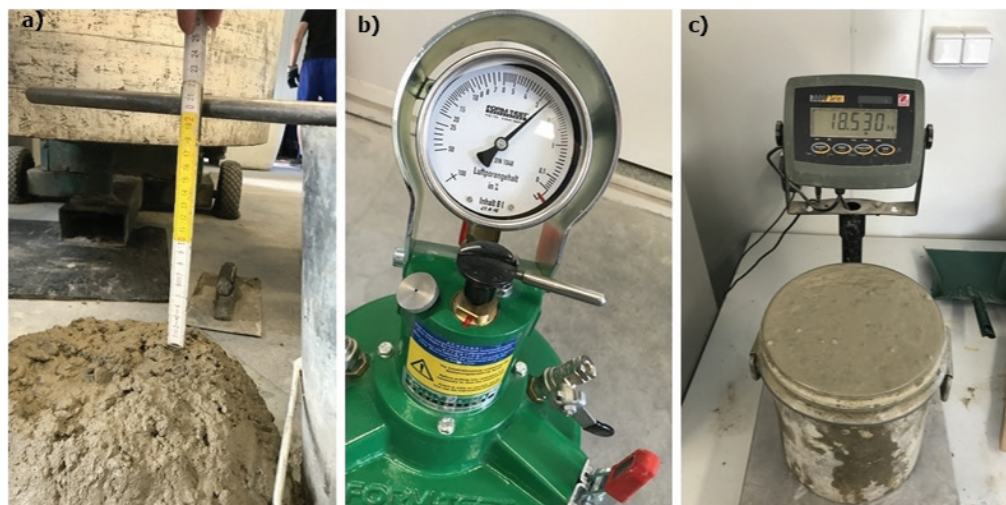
Testing of the concrete mixture: a) slump test of the concrete mixture; b) air content test of the concrete mixture; c) bulk density test of the mixture
